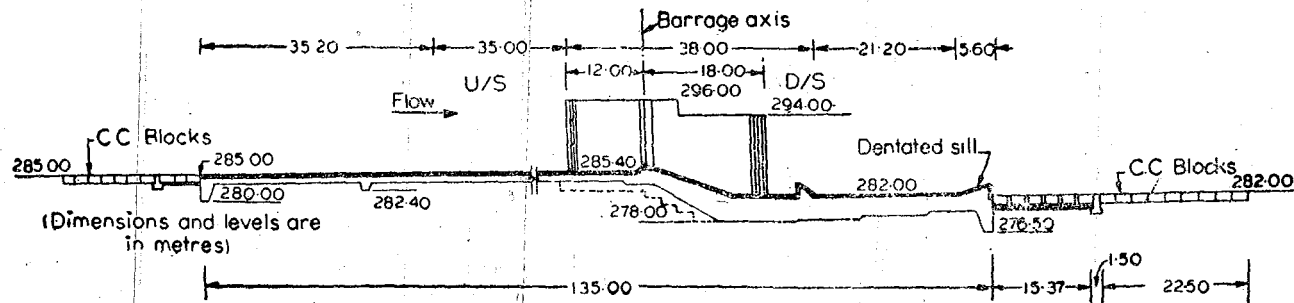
(b). Section through barrage bays of New Bhimgoda Barrage
